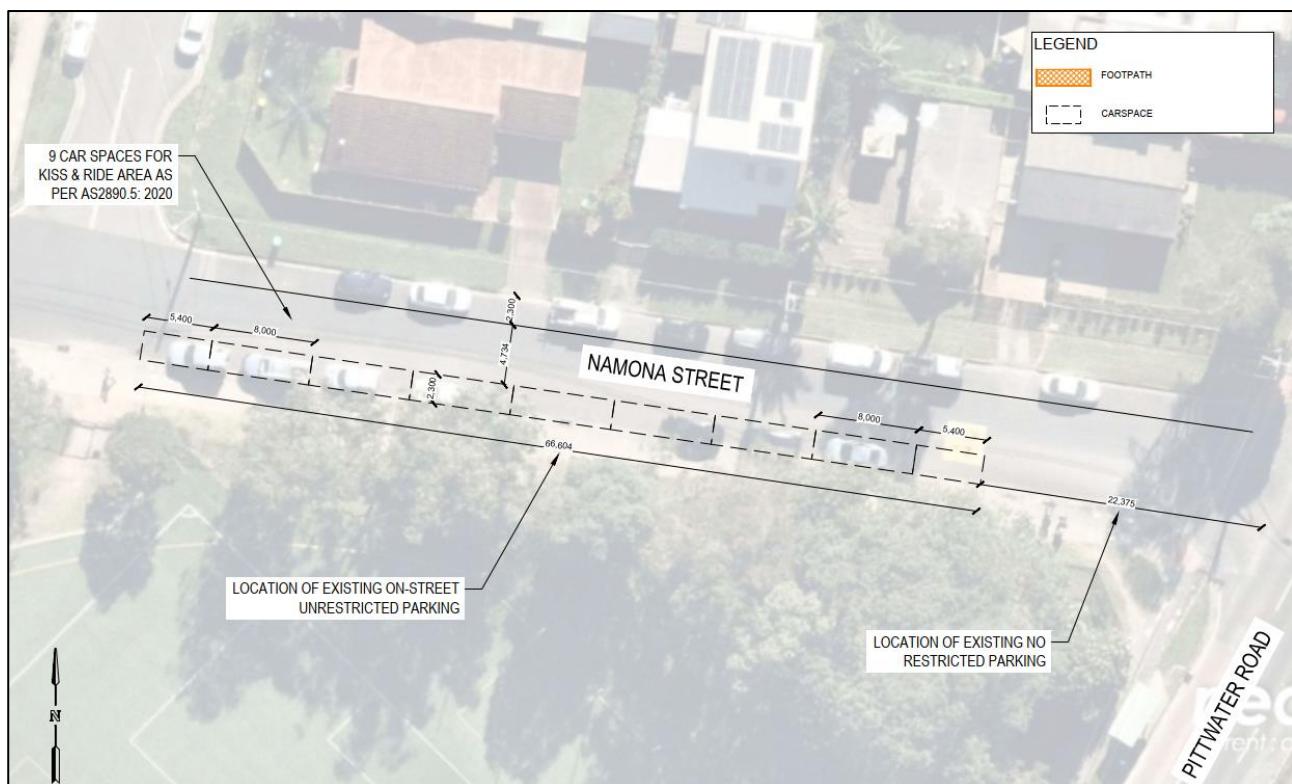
Proposed Kiss and Ride Facility on Namona Street
